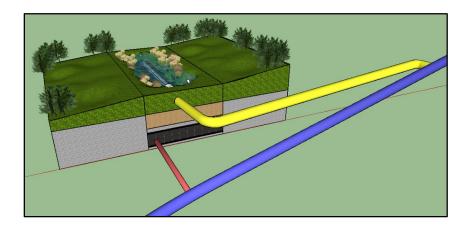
Existing storm drain in blue, upper bypass in yellow, lower bypass in red.
